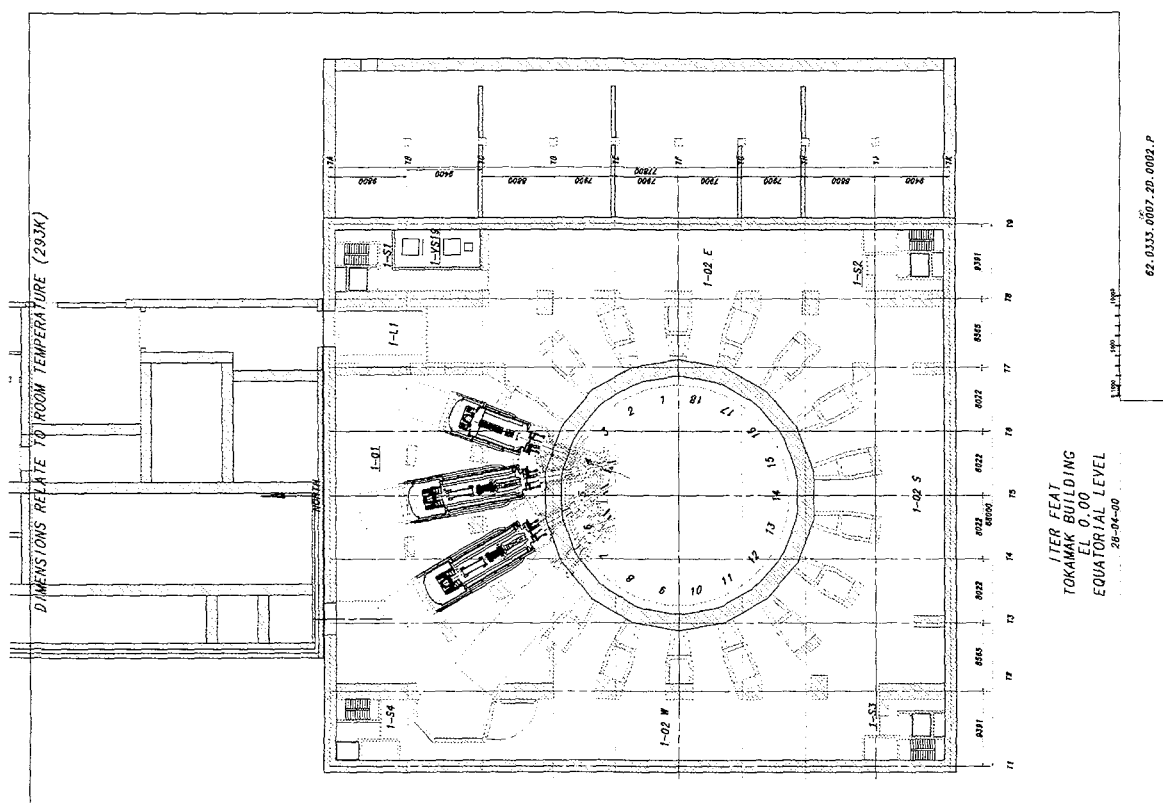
(a) Tokamak Building Floor Plan at Equatorial Port Level Showing Vertical Penetrations.
